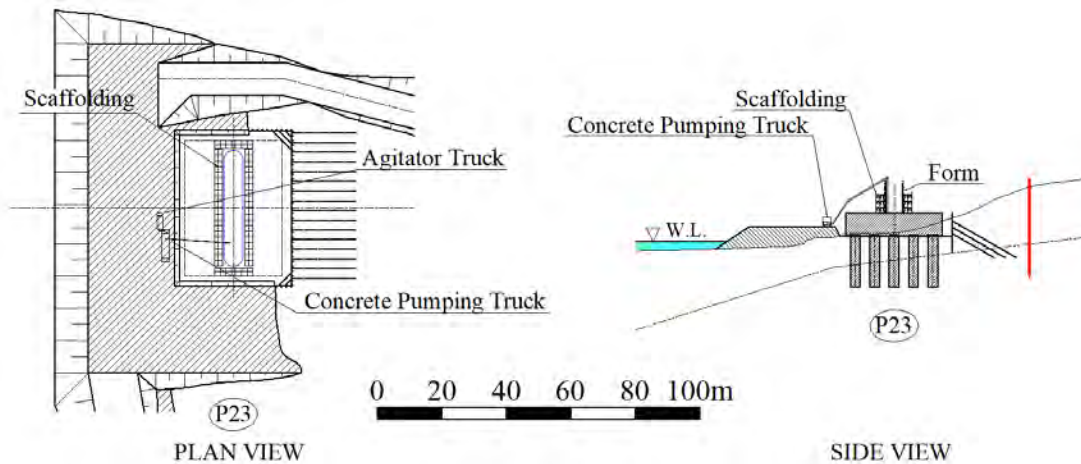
Reference Drawing for Construction of Pier (Placing Concrete)
